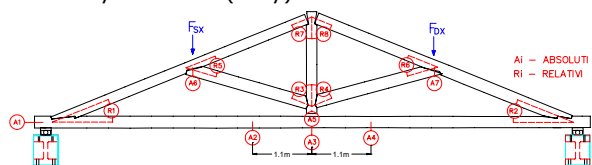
Setup of the full-scale tests over two king-post trusses.
